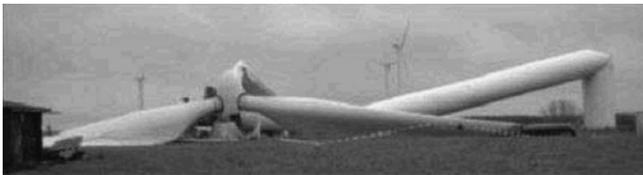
Collapsed wind turbine tower due to fatigue cracks and wind loading combination
